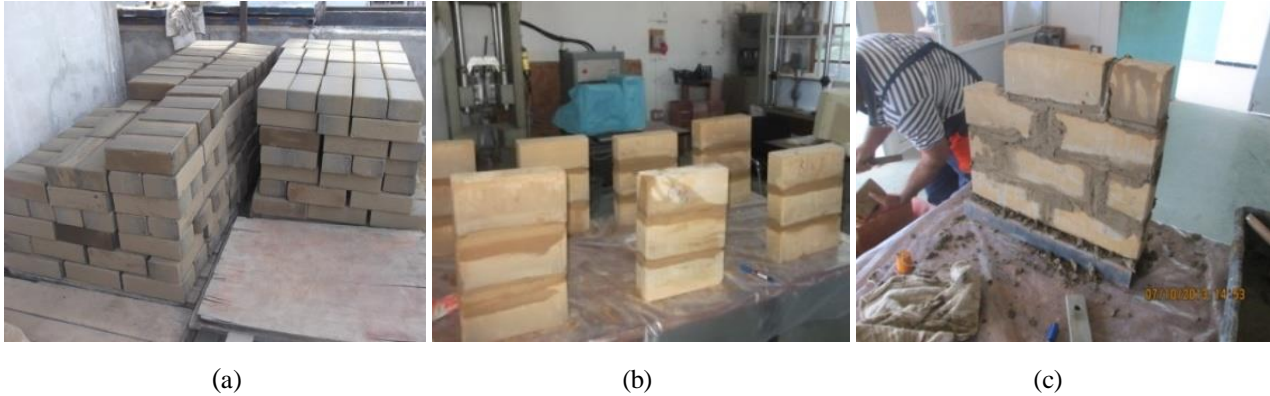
Fabrication earth blocks masonry walls, (a) CSEB, (b) triplets, (c) wall.
